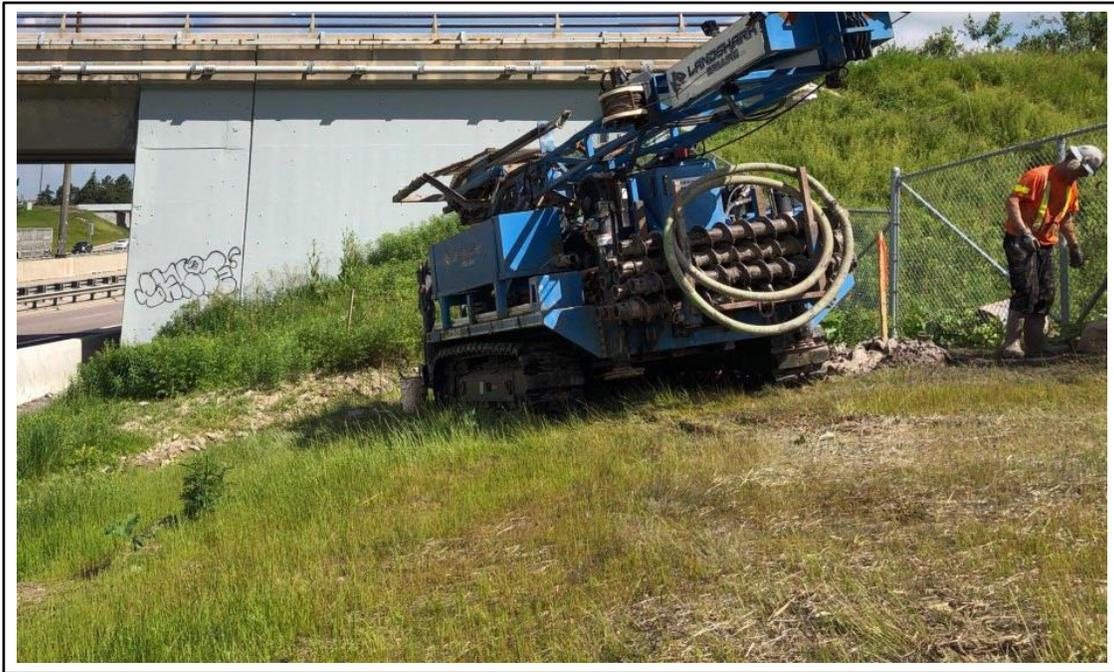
Borehole CN 16-09, looking North at the existing East Abutment of the Metrolinx Bridge
